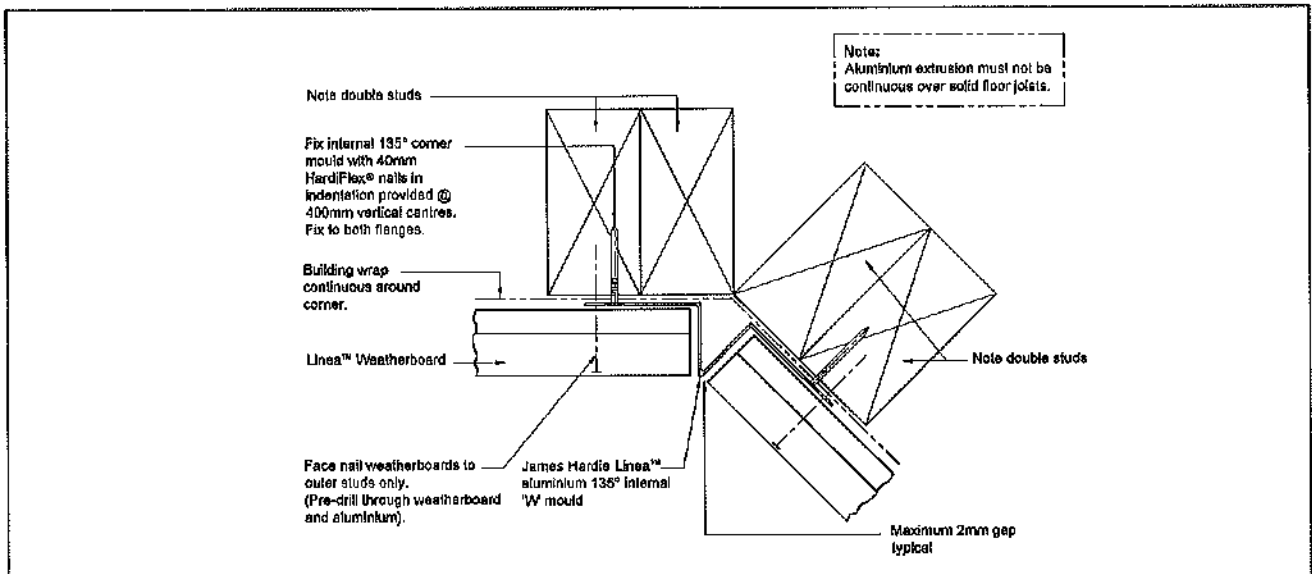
DIRECT FIX INTERNAL 135° ALUMINIUM 'W' MOULD CORNER
